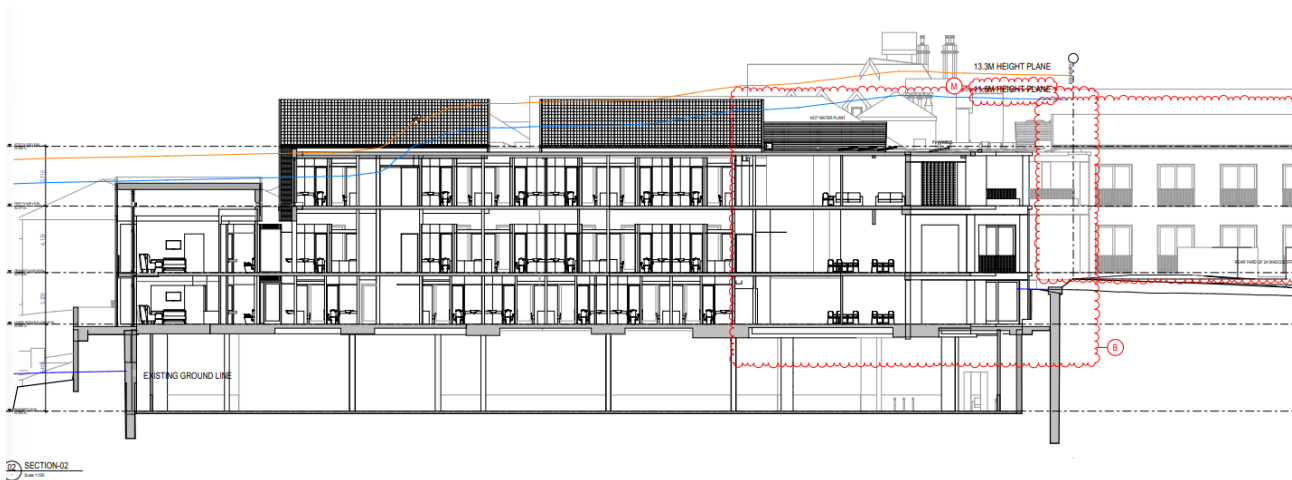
Annotated section 2 showing roof element of the new western wing sitting above the height plane (Source: PBD Architects)
